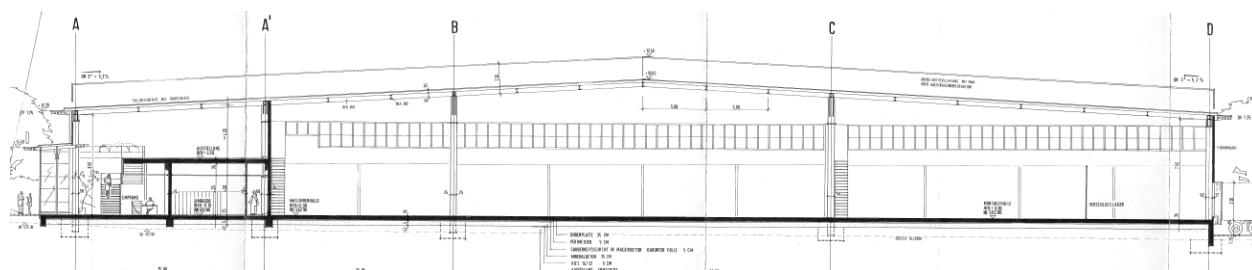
Section B-B of the Hall by Schöne + Seeburger
